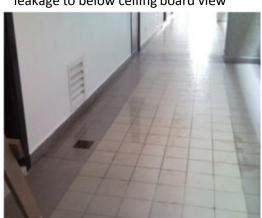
Room entrance floor water stained due to leakage from above RC slab
